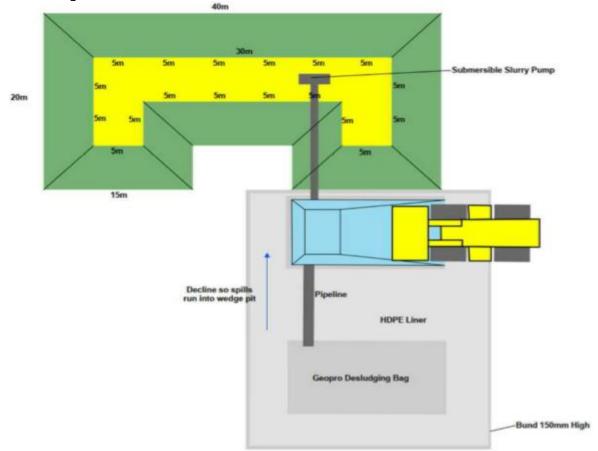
Layout of sedimentation pond with wedge pit and GeoPro desludging bag.
